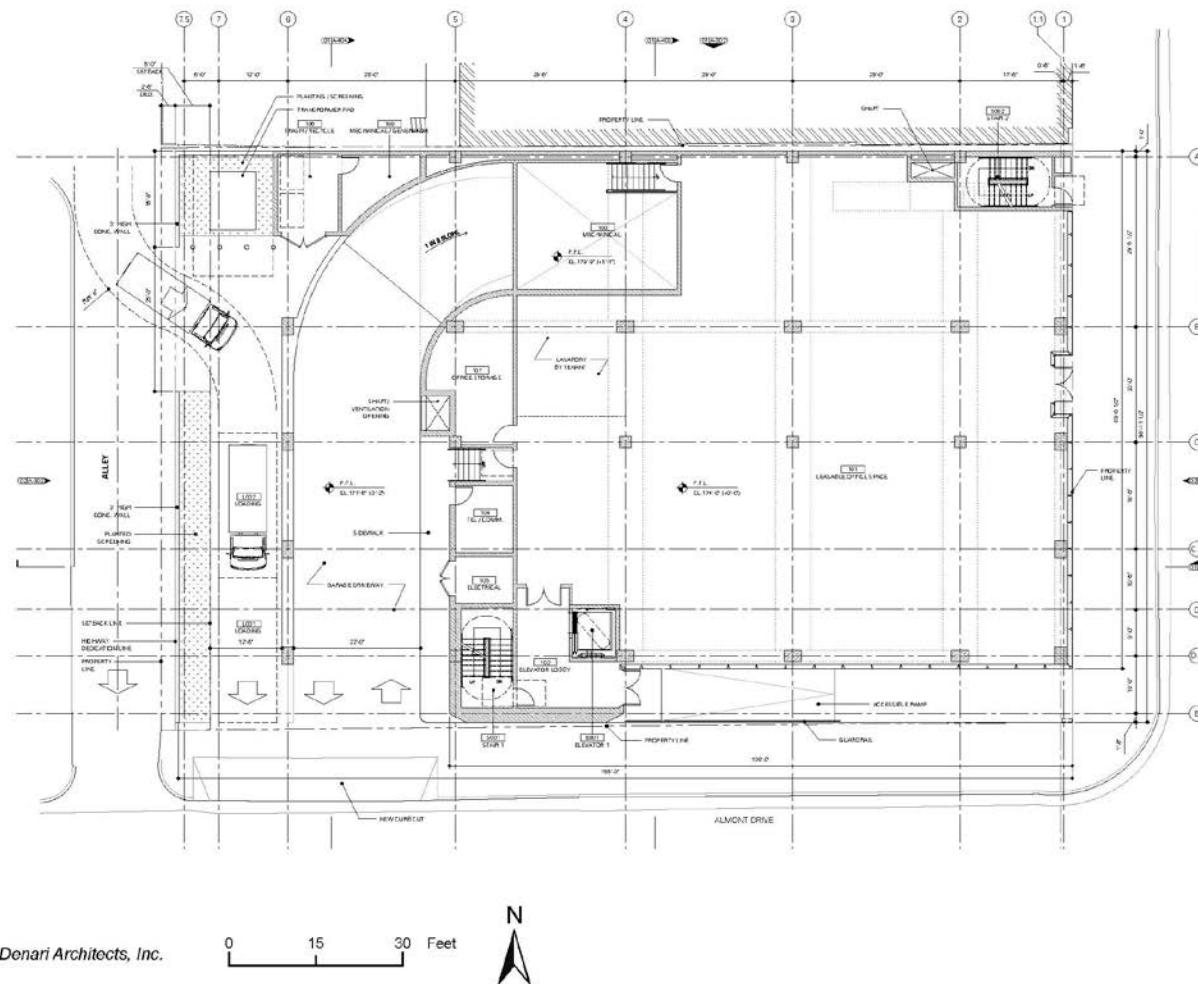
through 4f show proposed site plans, including subterranean parking plans, office level plans, and rooftop plans. Figure 5 shows photographs of the existing buildings on the project site that would be demolished to accommodate the proposed project, and Figure 6 shows renderings of the proposed project. Table 6 shows the characteristics of the proposed commercial office building.
